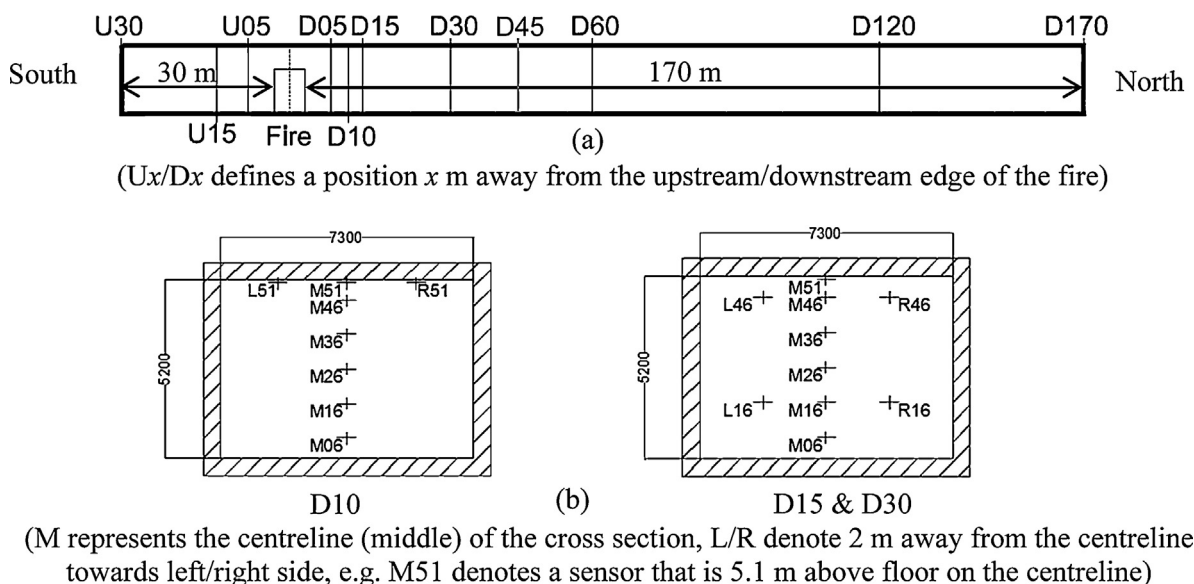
(a) Tunnel with the measurement locations, (b) tunnel cross sections.
